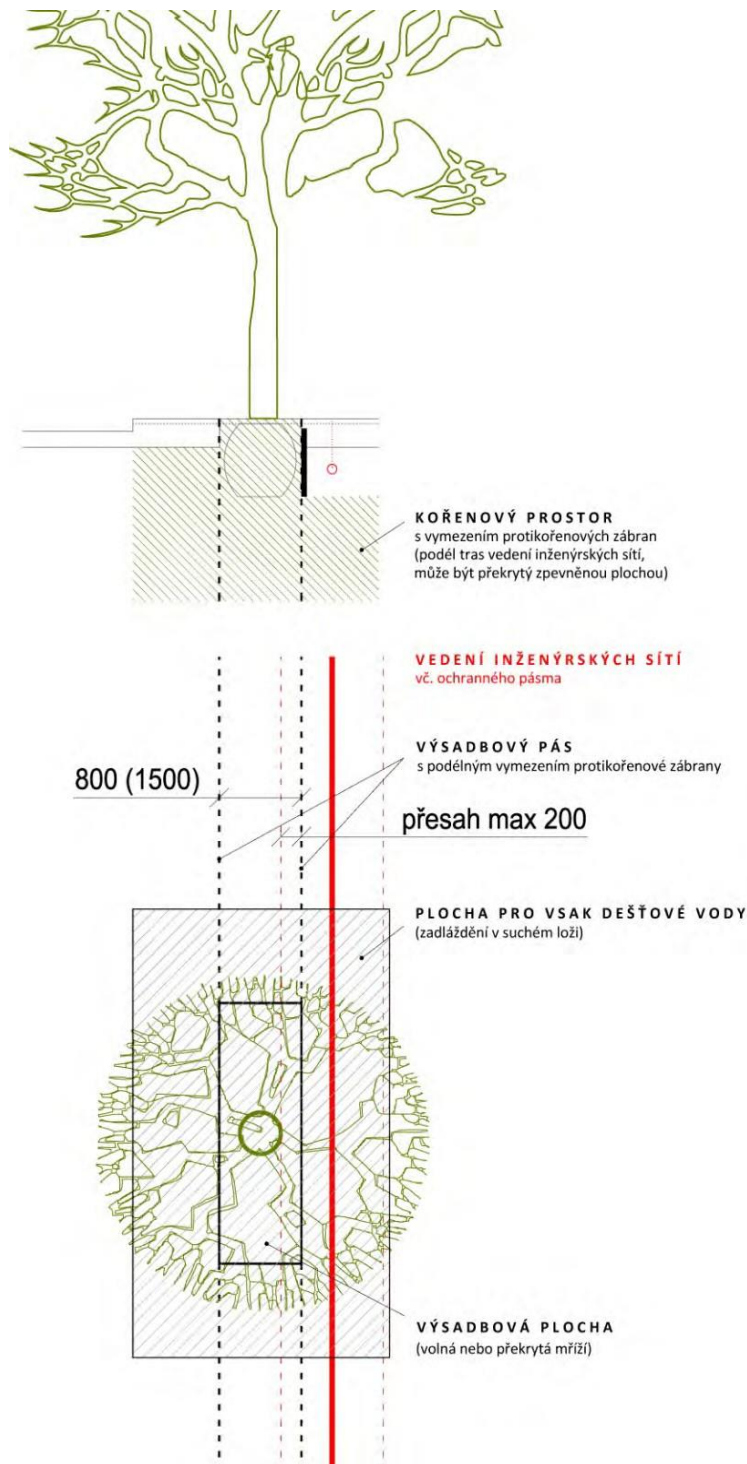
Trees and utility lines: planting strip, planting area, root space and area for absorption of rainwater
